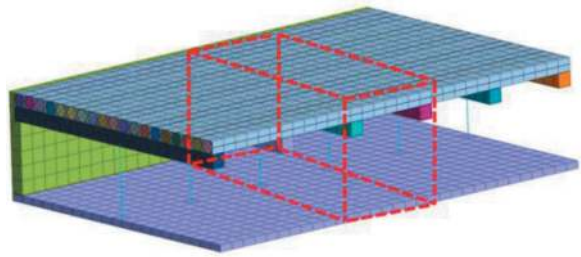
Schematic diagram of finite element model of the pipe-roof structure.
